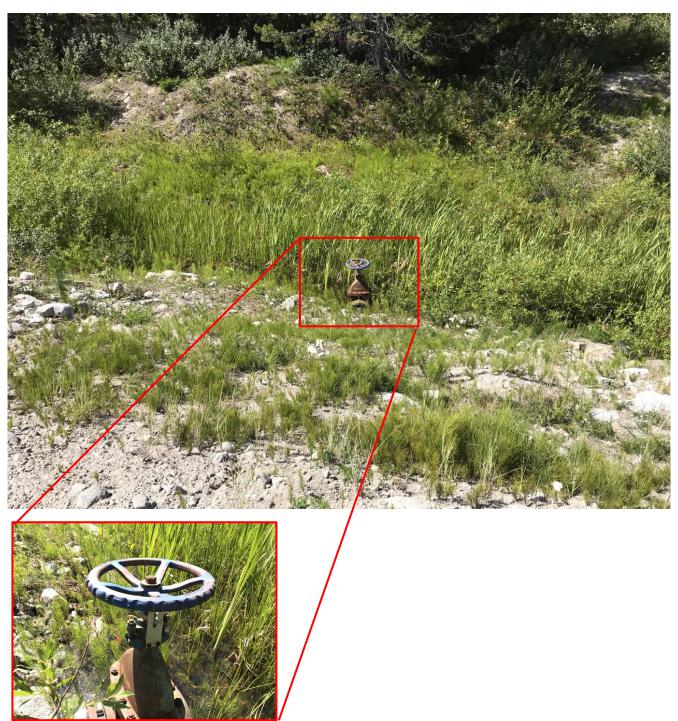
S5 Pond: Overview of downstream slope and Outlet #2 pipe daylighting at toe, looking east (HGH-2020-45)
